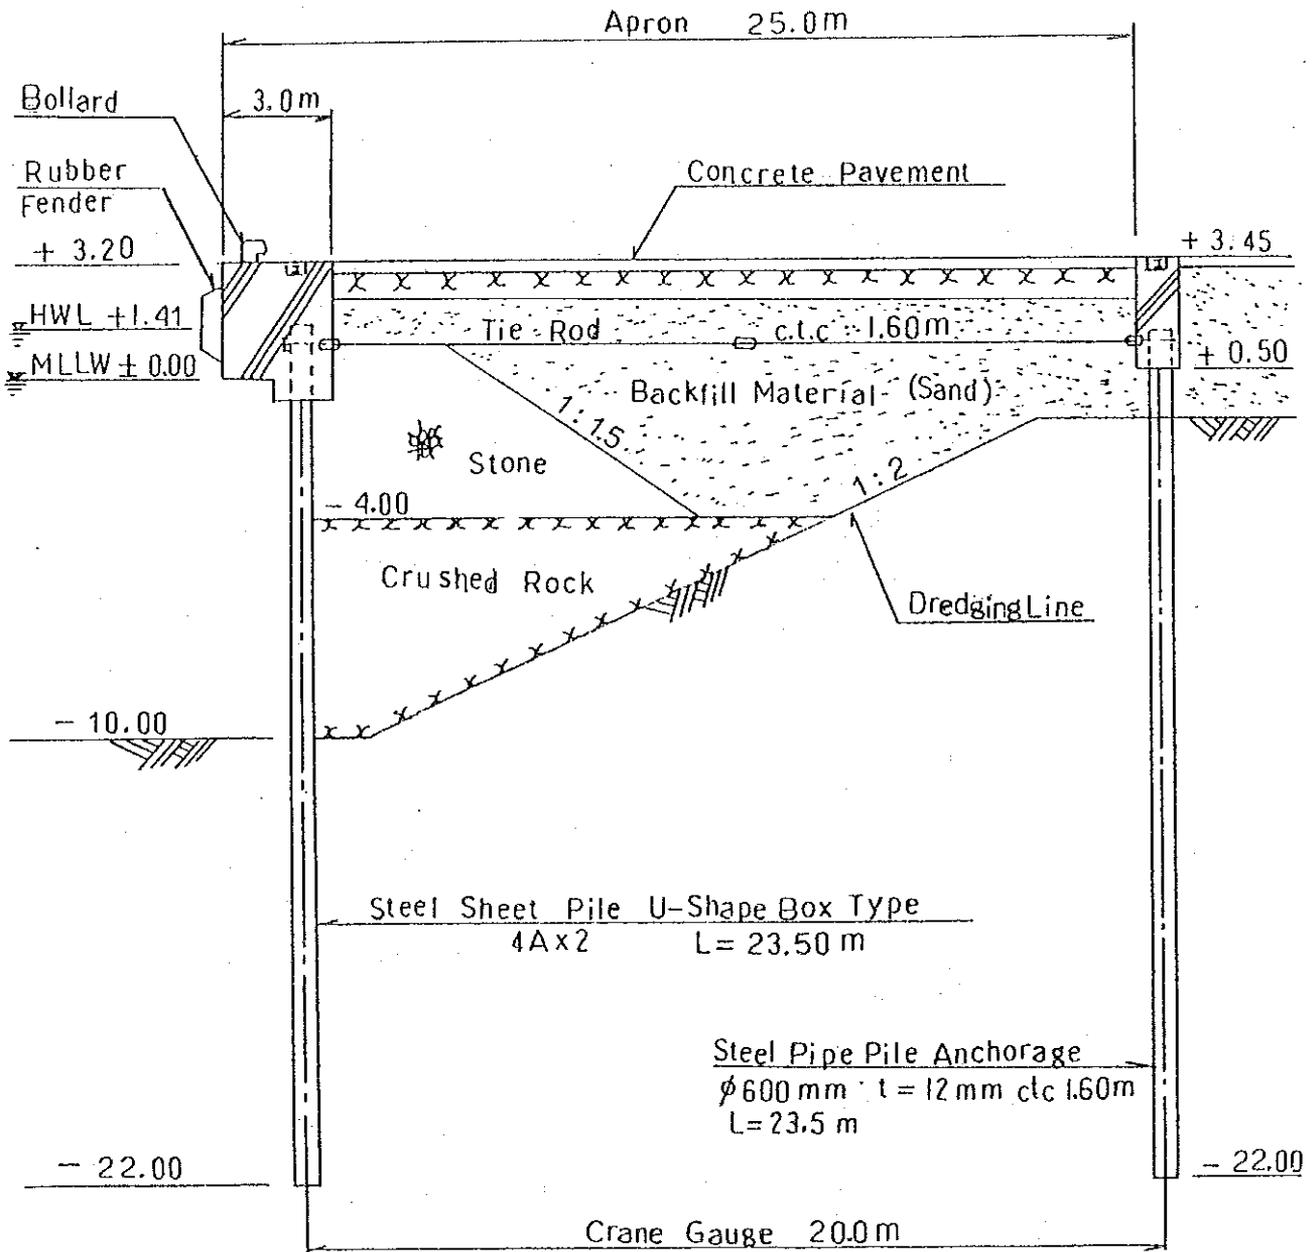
Typical Cross Section of -10m Container Berth at Batangas Port
